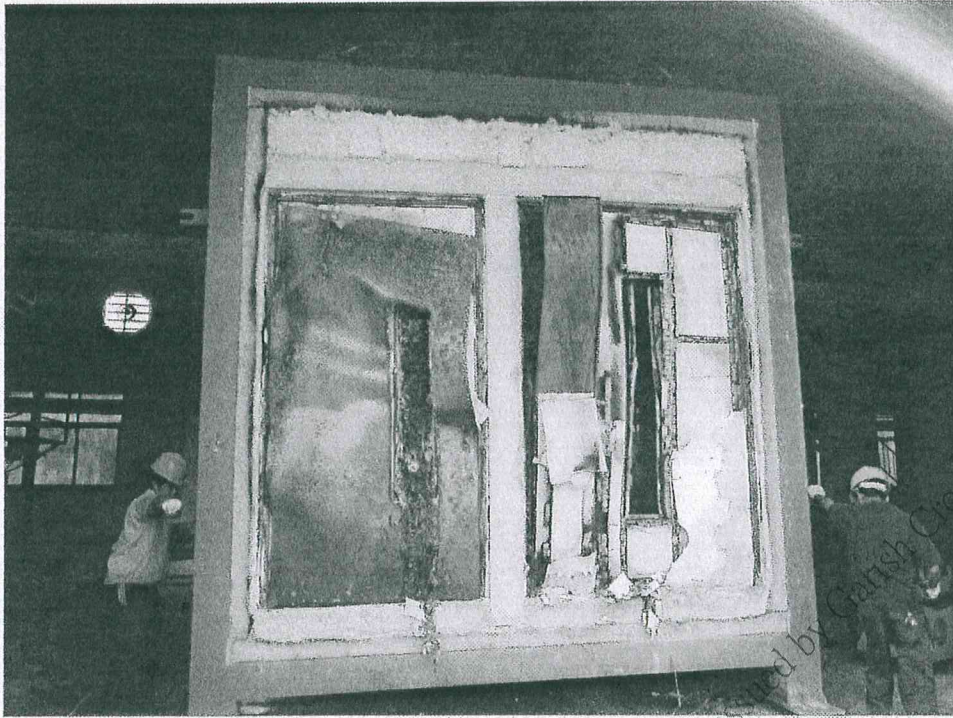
Exposed surface of the specimen after test. (Left: Door B; Right: Door A)
